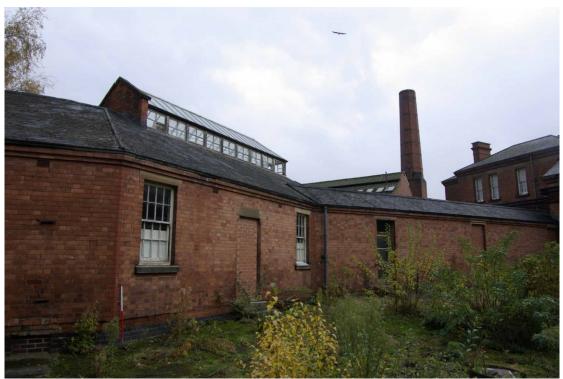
South facing elevation of main corridor to west of angled corridor to Daisy Peak Building Looking north-east, 1m scale.
